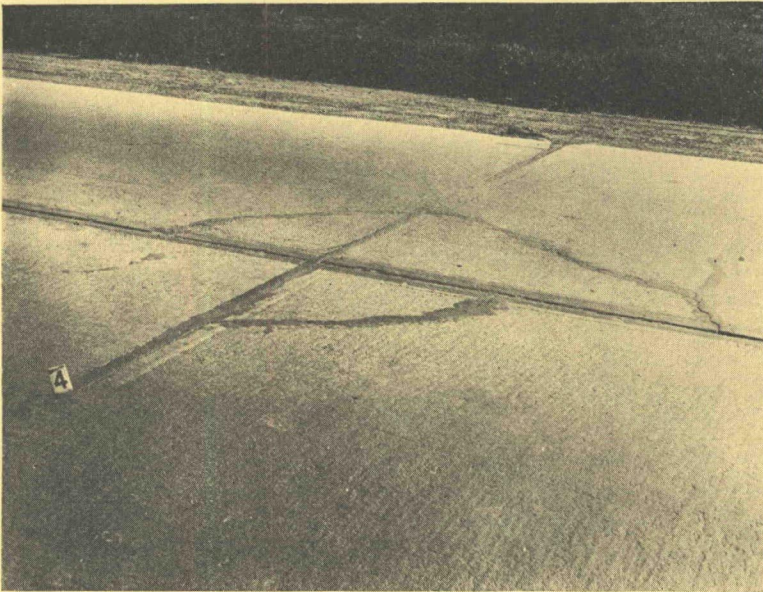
Five-inch resurfacing (along center line). No reinforcement. Three corner breaks at intersection of joints having neither dowels nor tie bars. Center joint a butt construction joint without tie bars. No dowels across transverse joint.
